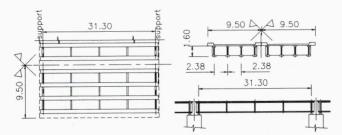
Typical simply supported p.c. deck built 20 to 30 years ago.
